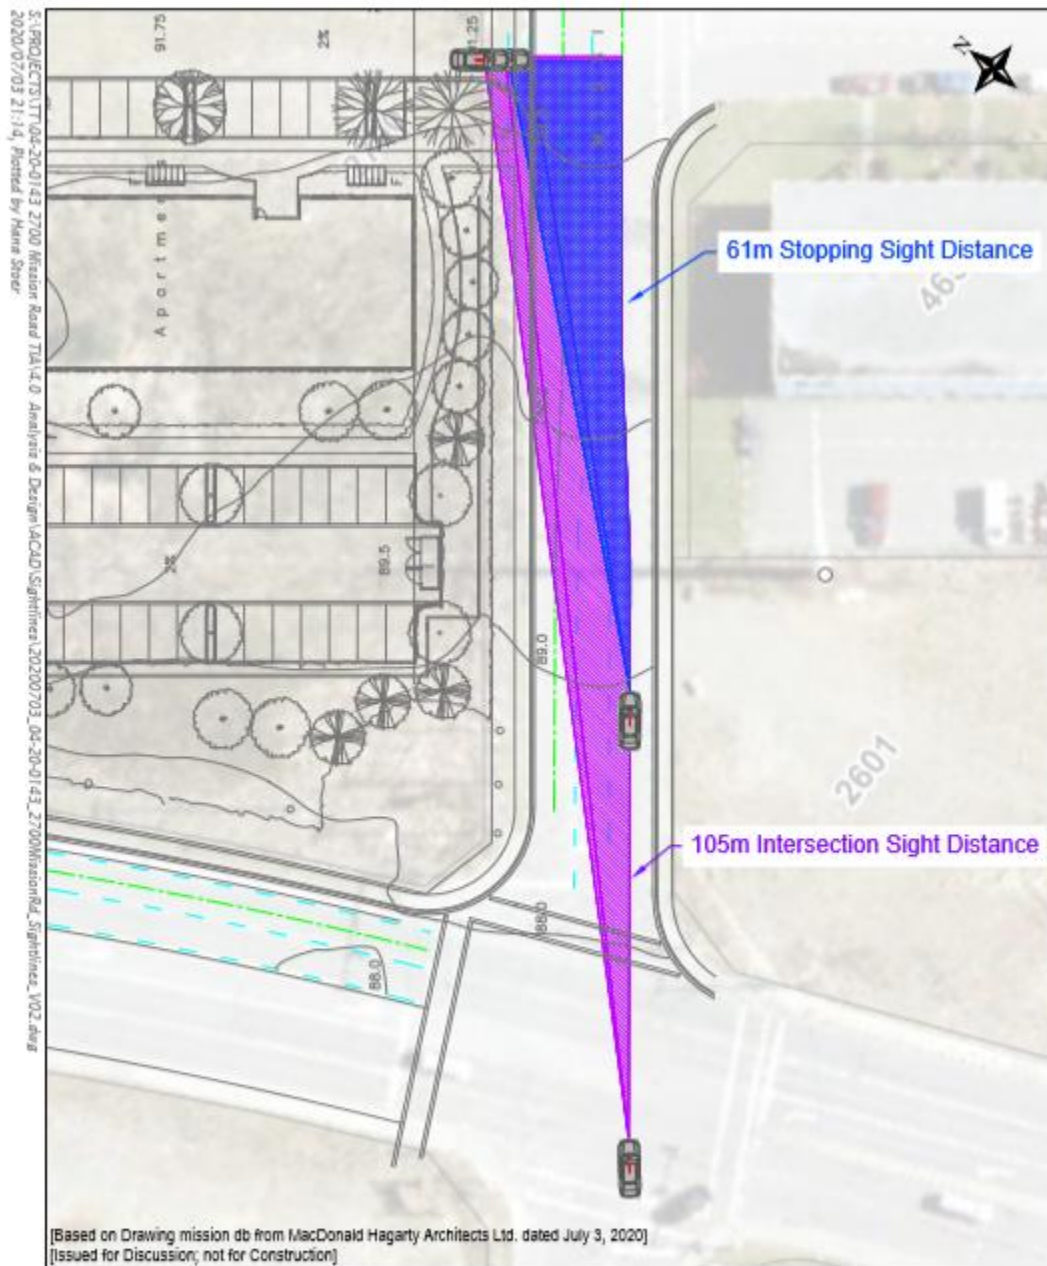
Mission Road Access West Side Sight Triangles
